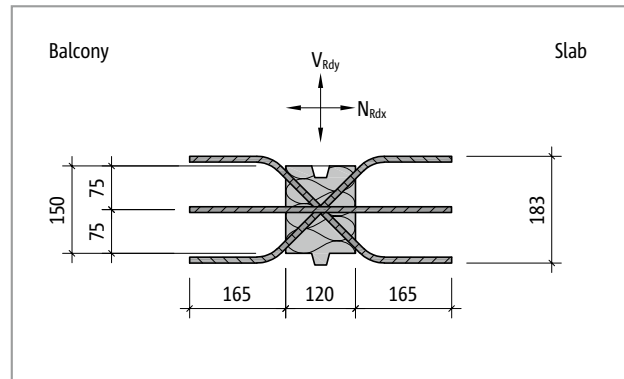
Schöck Isokorb® XT type H-VV1-NN1: Product plan view
